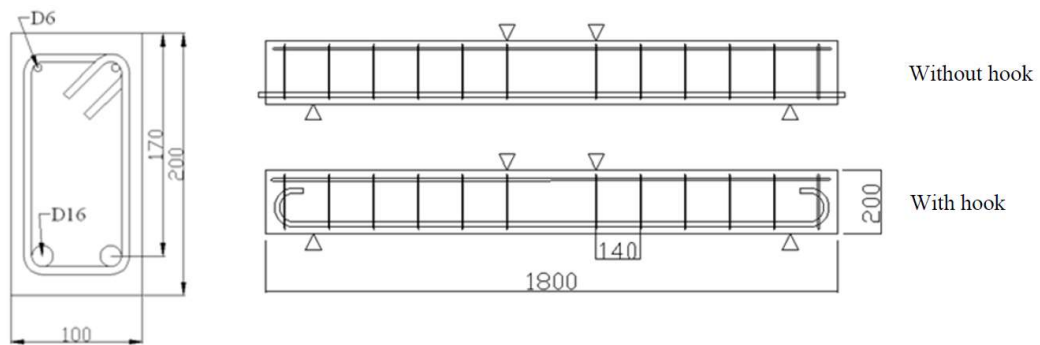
Cast specimens dimensions and cross-section (Mikata et al., 2018)
